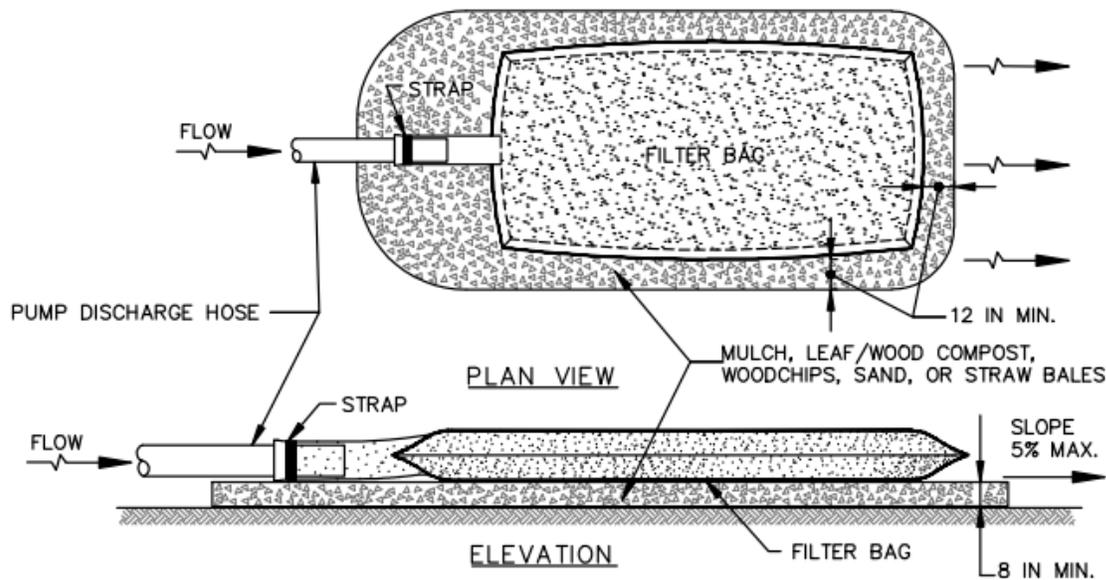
Schematic design of sediment bag detail (MDE, 2011).
